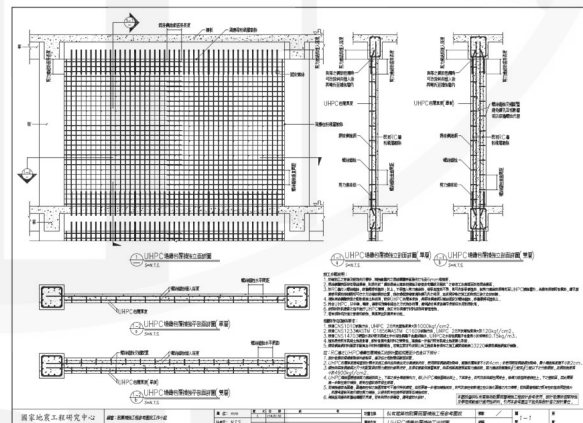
Reference diagram of UHPC application in the RC wall casting reinforcement method.
